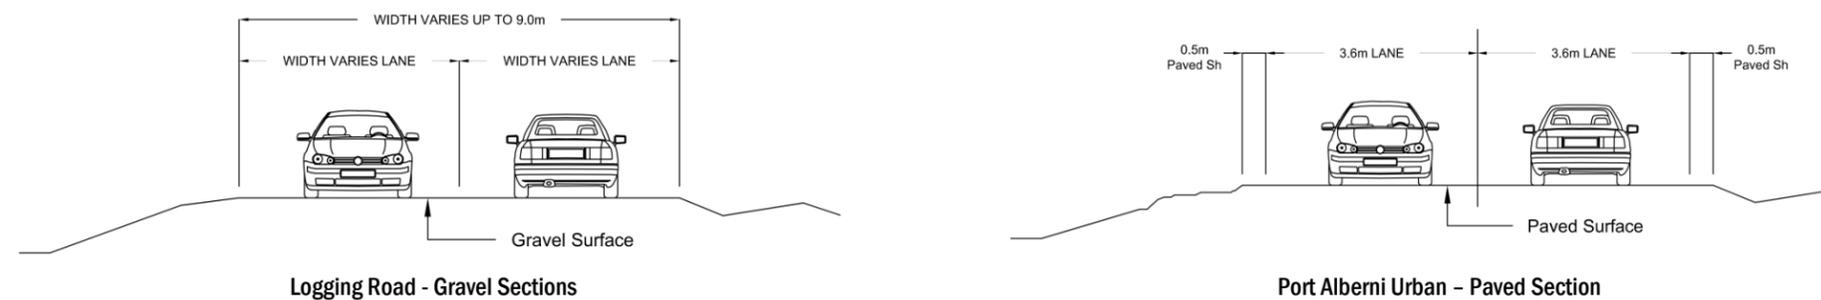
ROUTE 3A – TYPICAL CROSS SECTIONS
